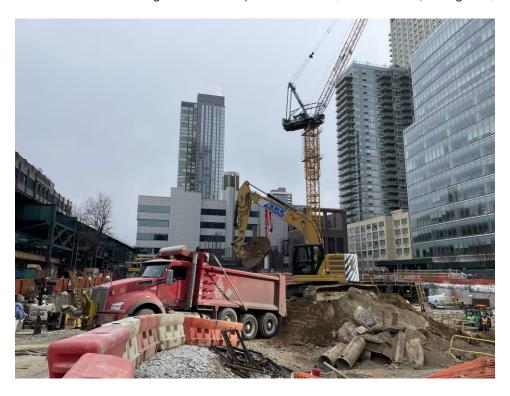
ECD loading a truck for off-site disposal (facing northeast).
